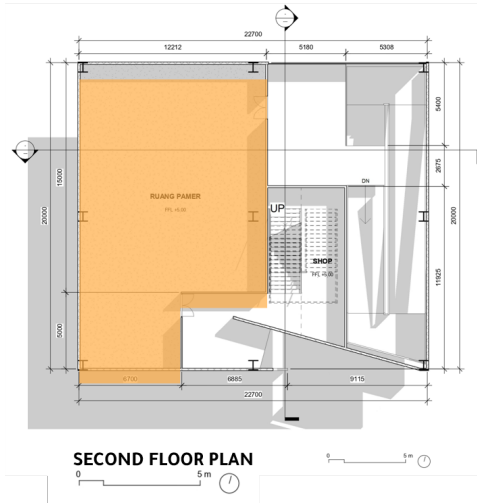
Second floor plan of Tirtanadi Water Museum.
